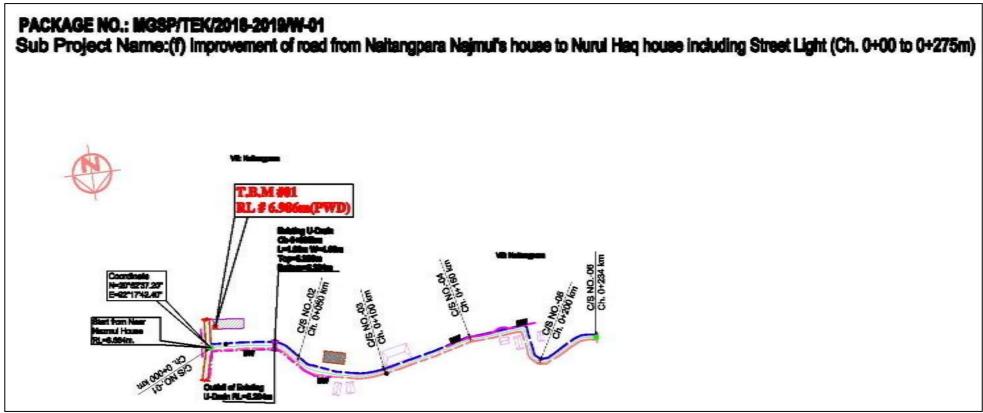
(f): Layout Plan for the proposed Subproject (f) Naitangpara Najmul's house to Nurul Hoq house
